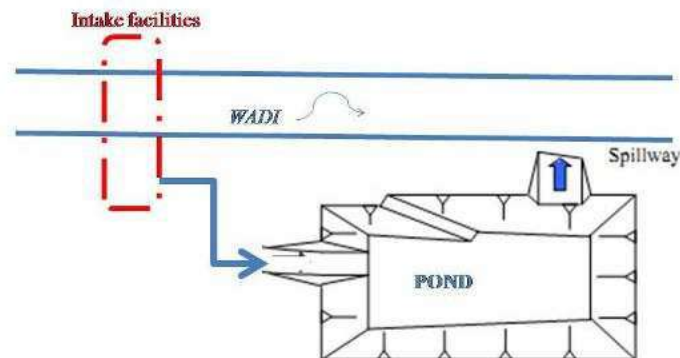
Schematic Diagram for a proposed Flood Water Harvesting Ponds, Source:(Ridini et al., 2013).
